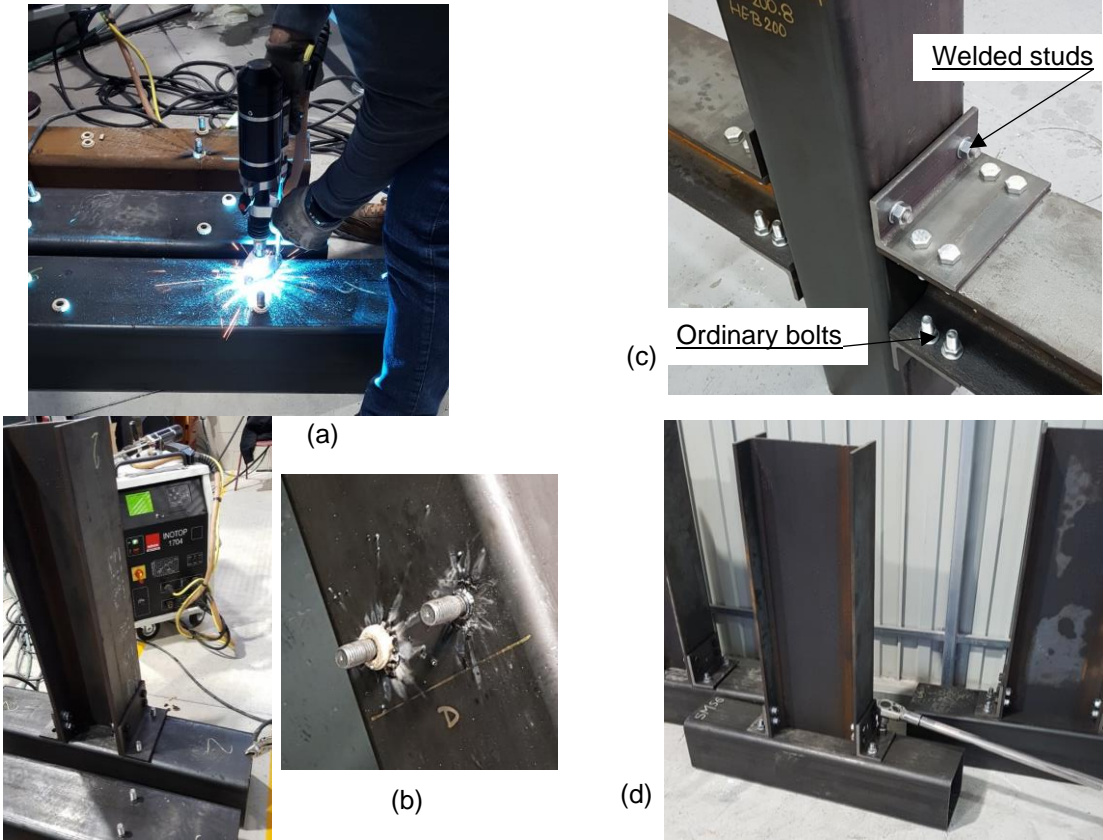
Preparation of specimens. (a) Welder gun. (b) Welded studs. (c) Double side joint. (d) Single side
